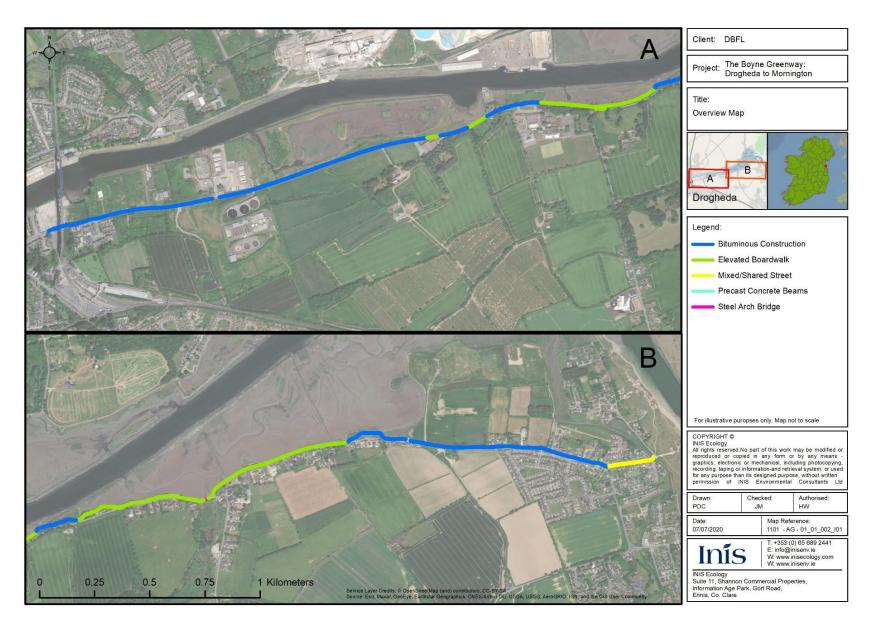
Construction methods for the proposed Boyne Greenway.
